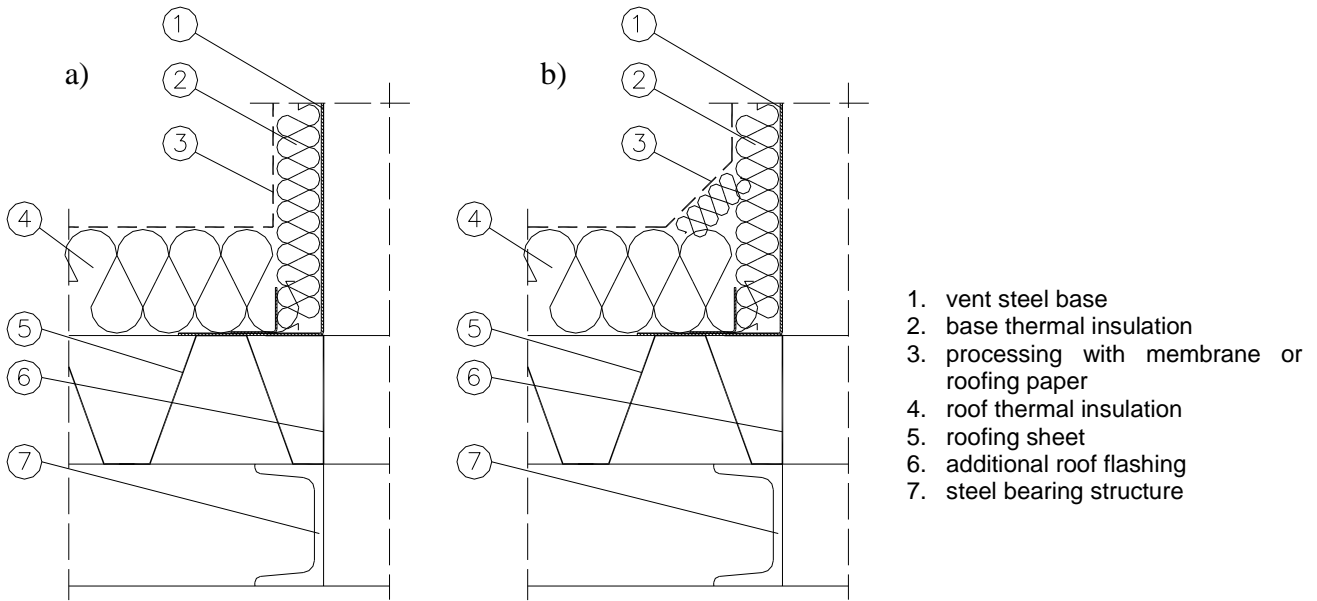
Steel base on steel structure (a - membrane flashing, b - roofing paper flashing)
